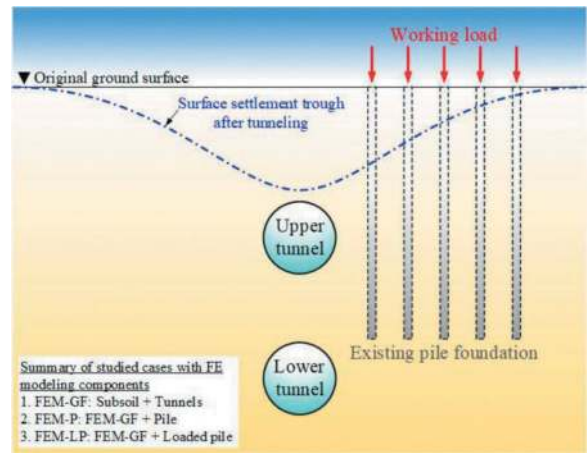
Schematic diagram of considered twin-stacked tunneling adjacent pile structures.
